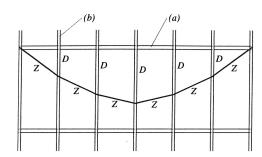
Trussed beam. (a) Braced beam, (b) purlin.
